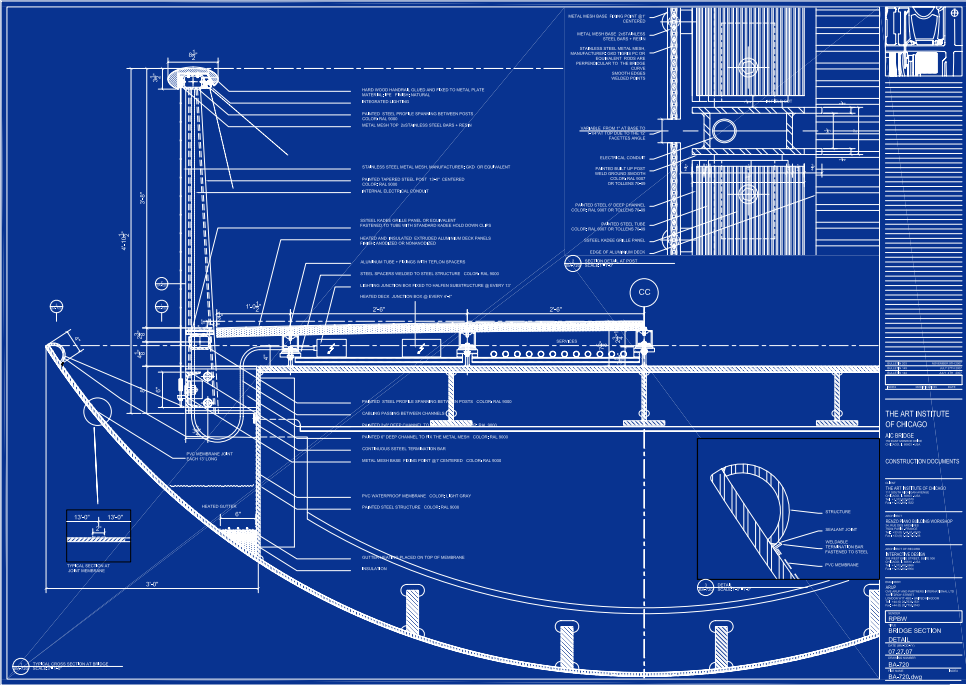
Renzo Piano Building Workshop's typical cross section drawing of Nichols Bridgeway
